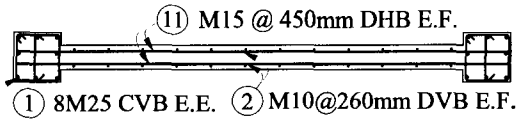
Modeling of shear wall sections for B12 located in Montréal
